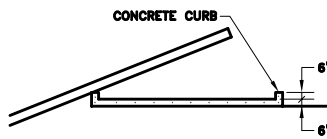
DETAIL OF OPTIONAL TEMPORARY ANCHOR TRENCH IN COVER
